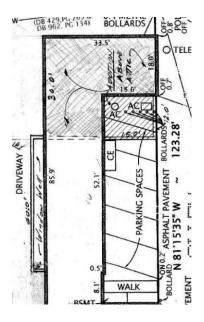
Detail of site plan indicating encapsulation. Window well/north to left. 12' x 15' addition in area where AC units shown. Hatched area is rear block to be heightened to 50' tall.
